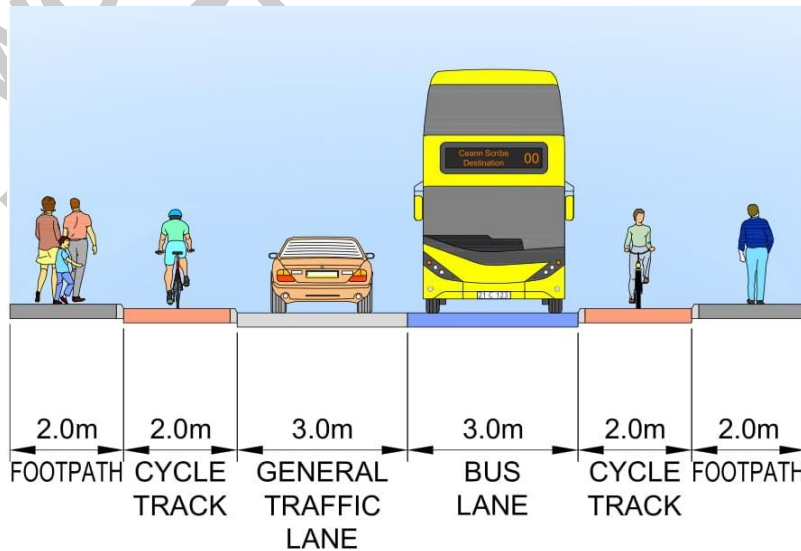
Section 2, Proposed Option 5 – Cross Section A-A
